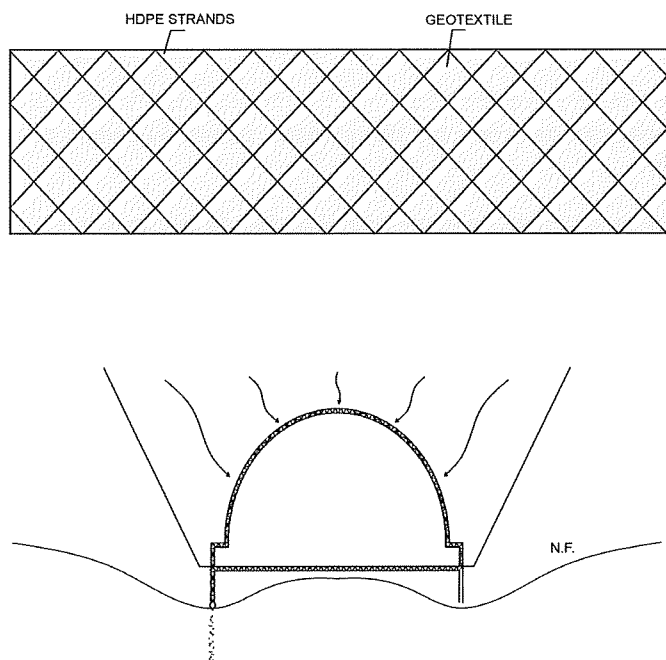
Drainage geomat. Detail and standard cut-and-cover tunnel cross-section
